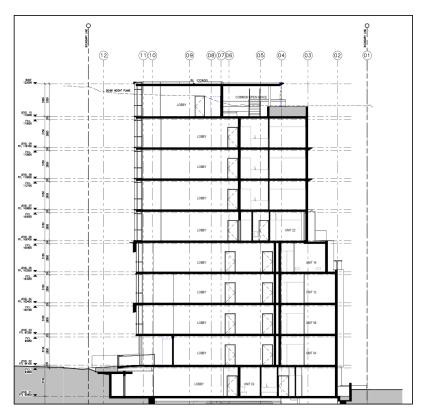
A short cross section of the development, shows the proposed elements to the 28.6 metre building height limit (denoted by the dotted line) Source: PSI Architects, 2025
